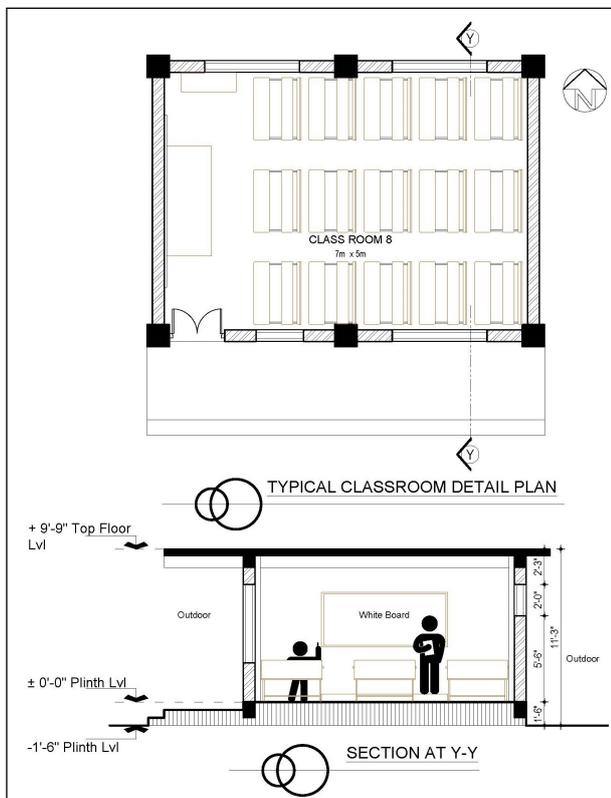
Detail floor plan and section of Shree Kankali Secondary School Classroom
